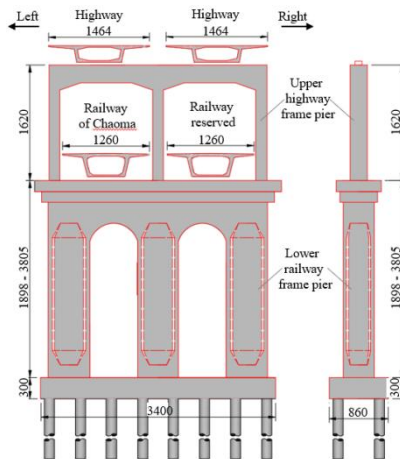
Typical section of Jiangxinzhou approach bridge of the Maanshan Yangtze River Rail-cum-Road Bridge (unit: cm).
